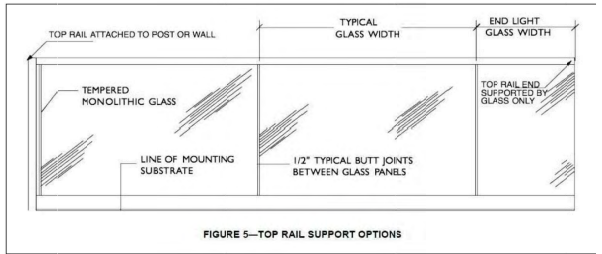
TOP RAIL SUPPORT OPTIONS
